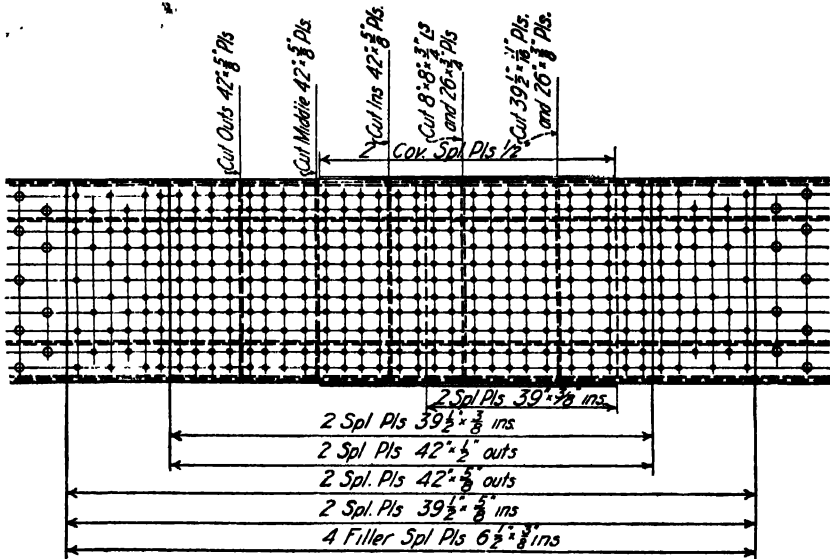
ii. Bottom Chord Tension Lap-splice for the 287-foot Span of the O.-W. R. R. & N. Company's Bridge over the Willamette River at Portland, Ore.
